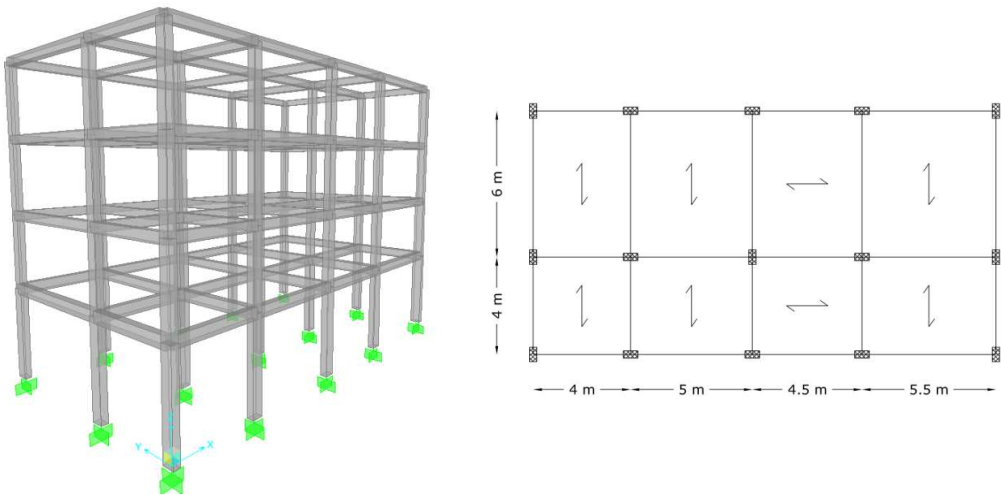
Geometry of the case-study building: (left) tri-dimensional view and (right) plan.
